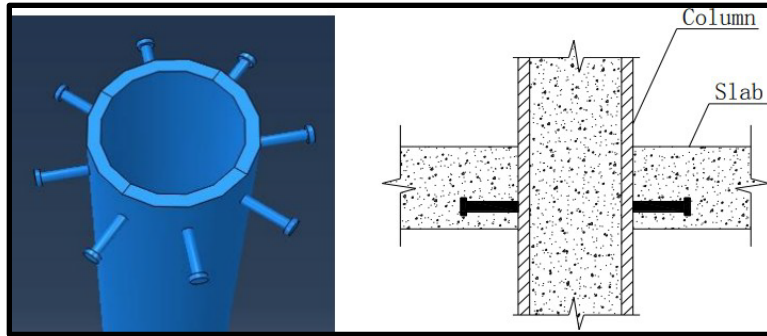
Arrangement of shear studs in steel tube to flat slab shear connection system
